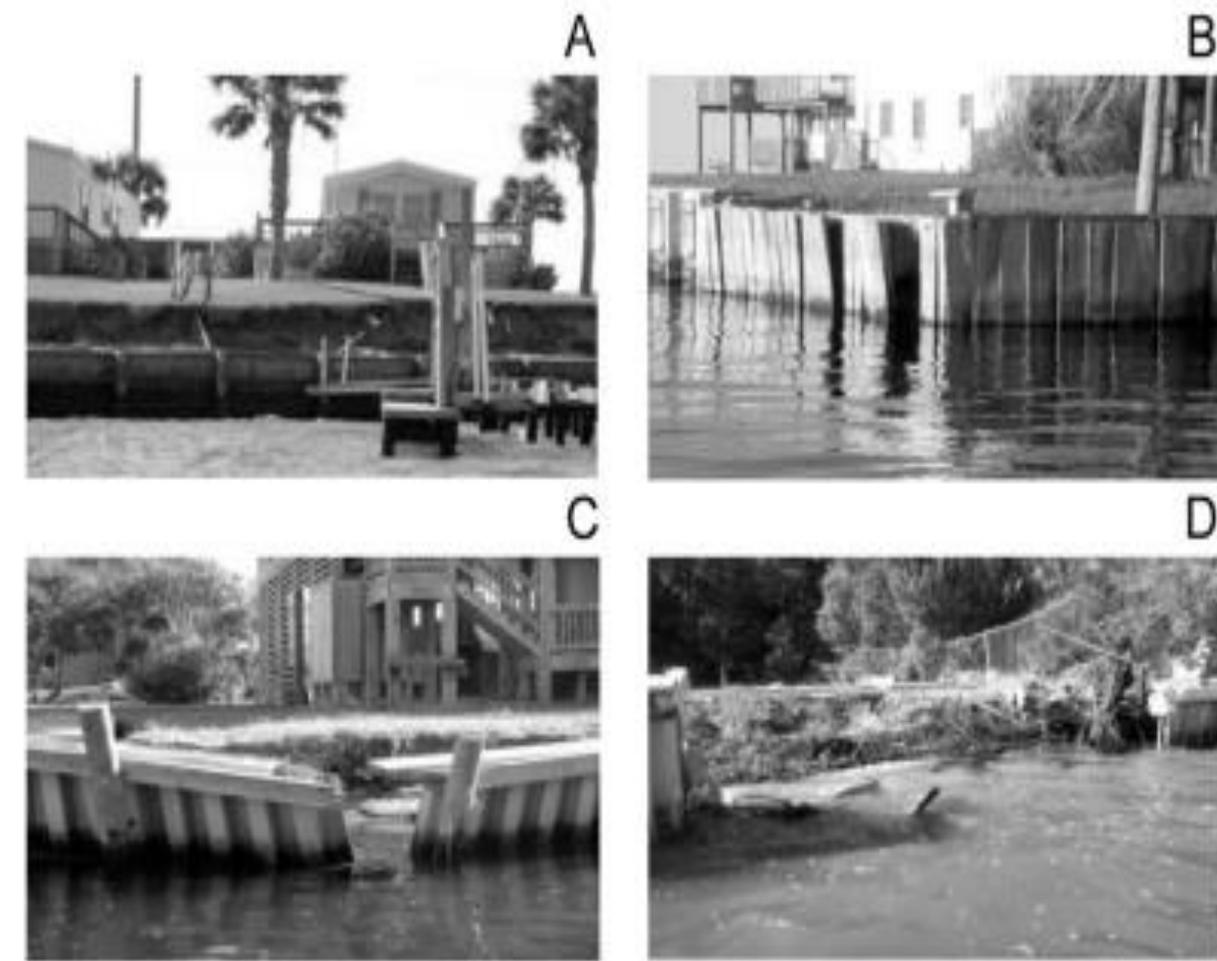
Bulkhead damage classifications: A) Landward erosion; B) Structural damage; C) Breach; and D) Collapse.
